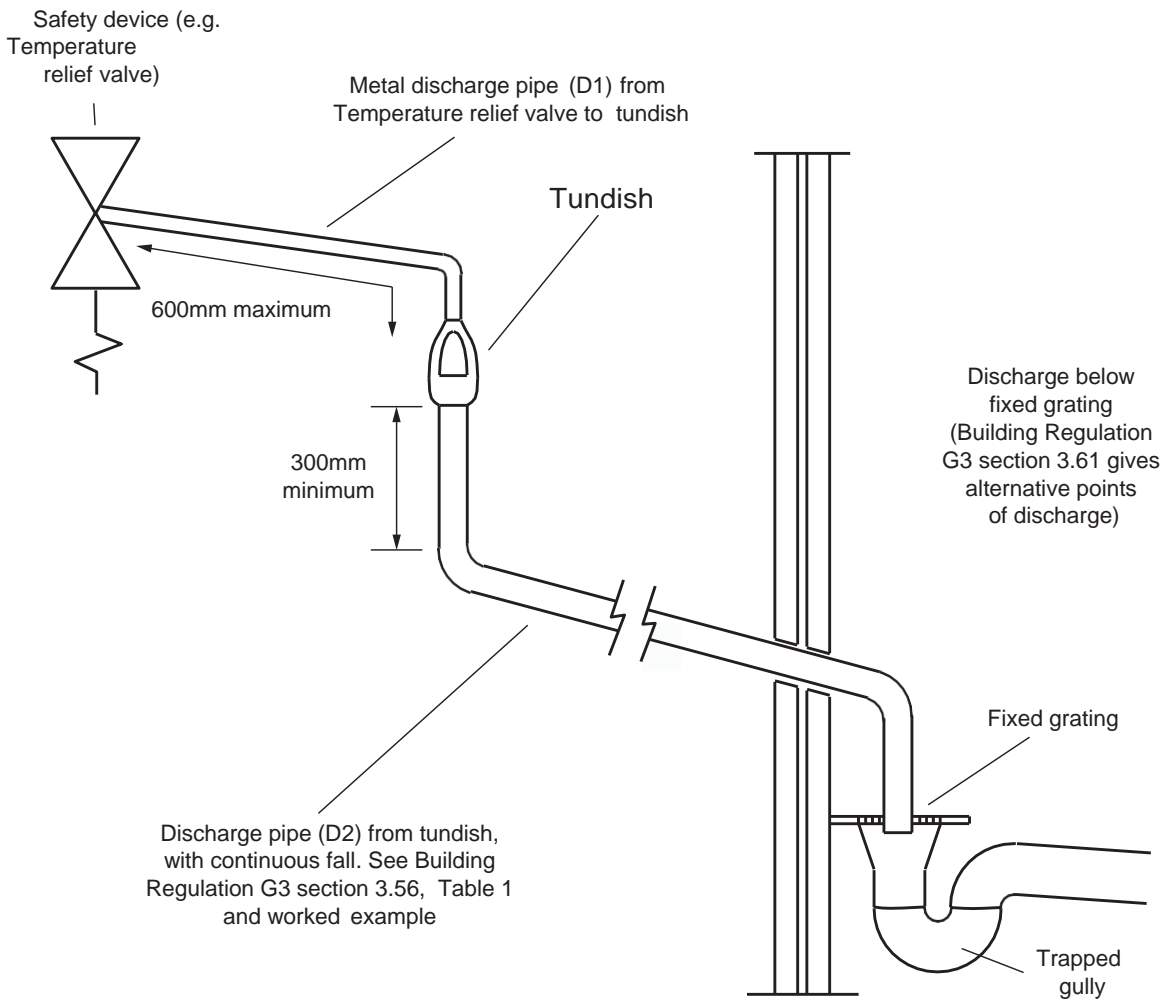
Typical discharge pipe arrangement (Extract from Building Regulations G3 Guidance section 3.5 to 3.63)
